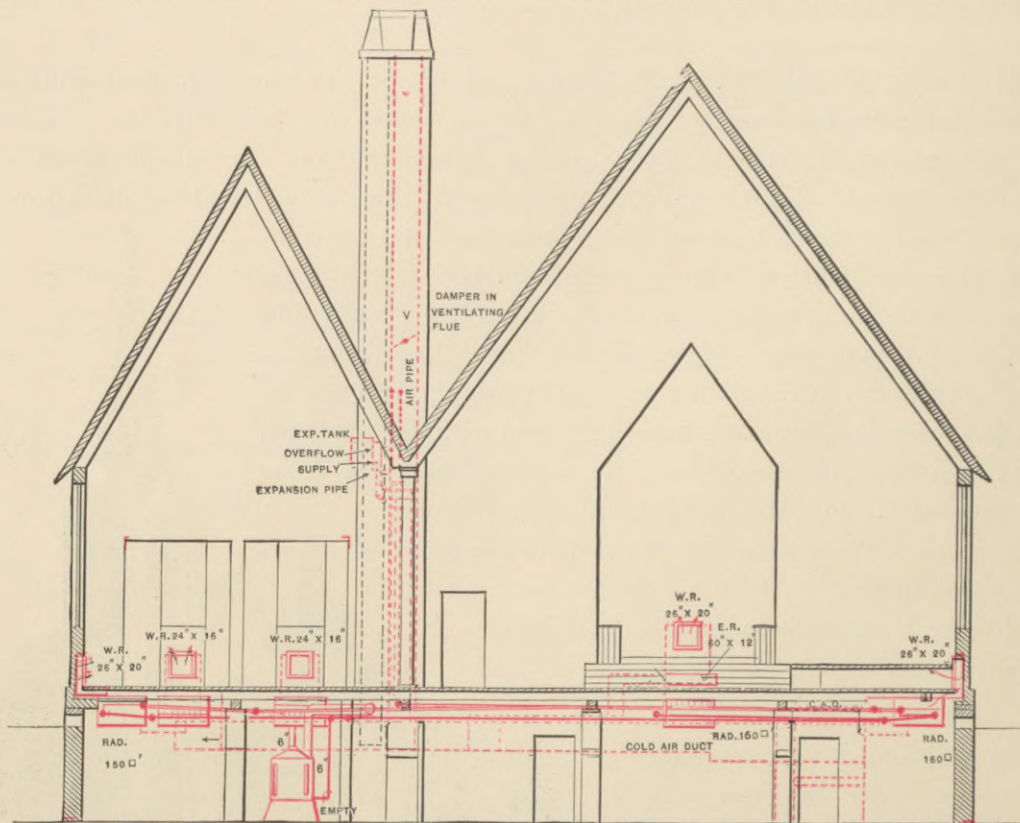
Sectional Transverse Elevation. Scale  $\frac{1}{8}$  inch to the foot.
